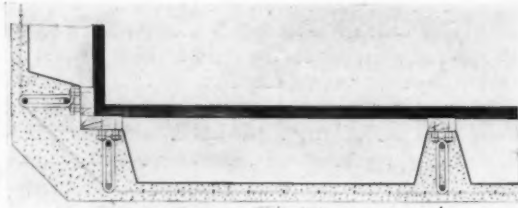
TYPICAL DETAIL OF GUN-CRETE EXTERIOR WALL CONSTRUCTION
